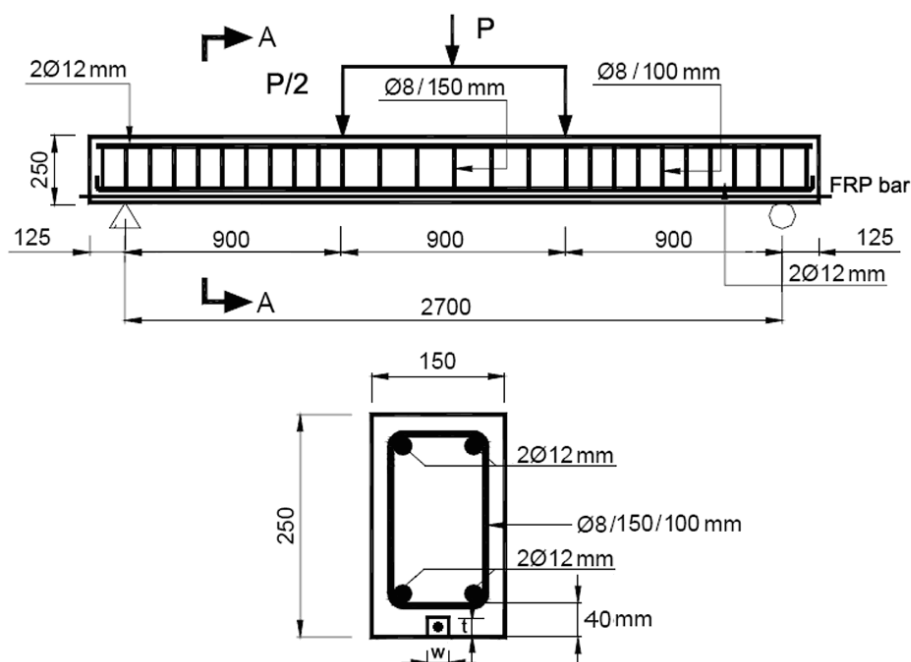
Beam details and test setup /Detalii de armare a grinzii și de testare.
